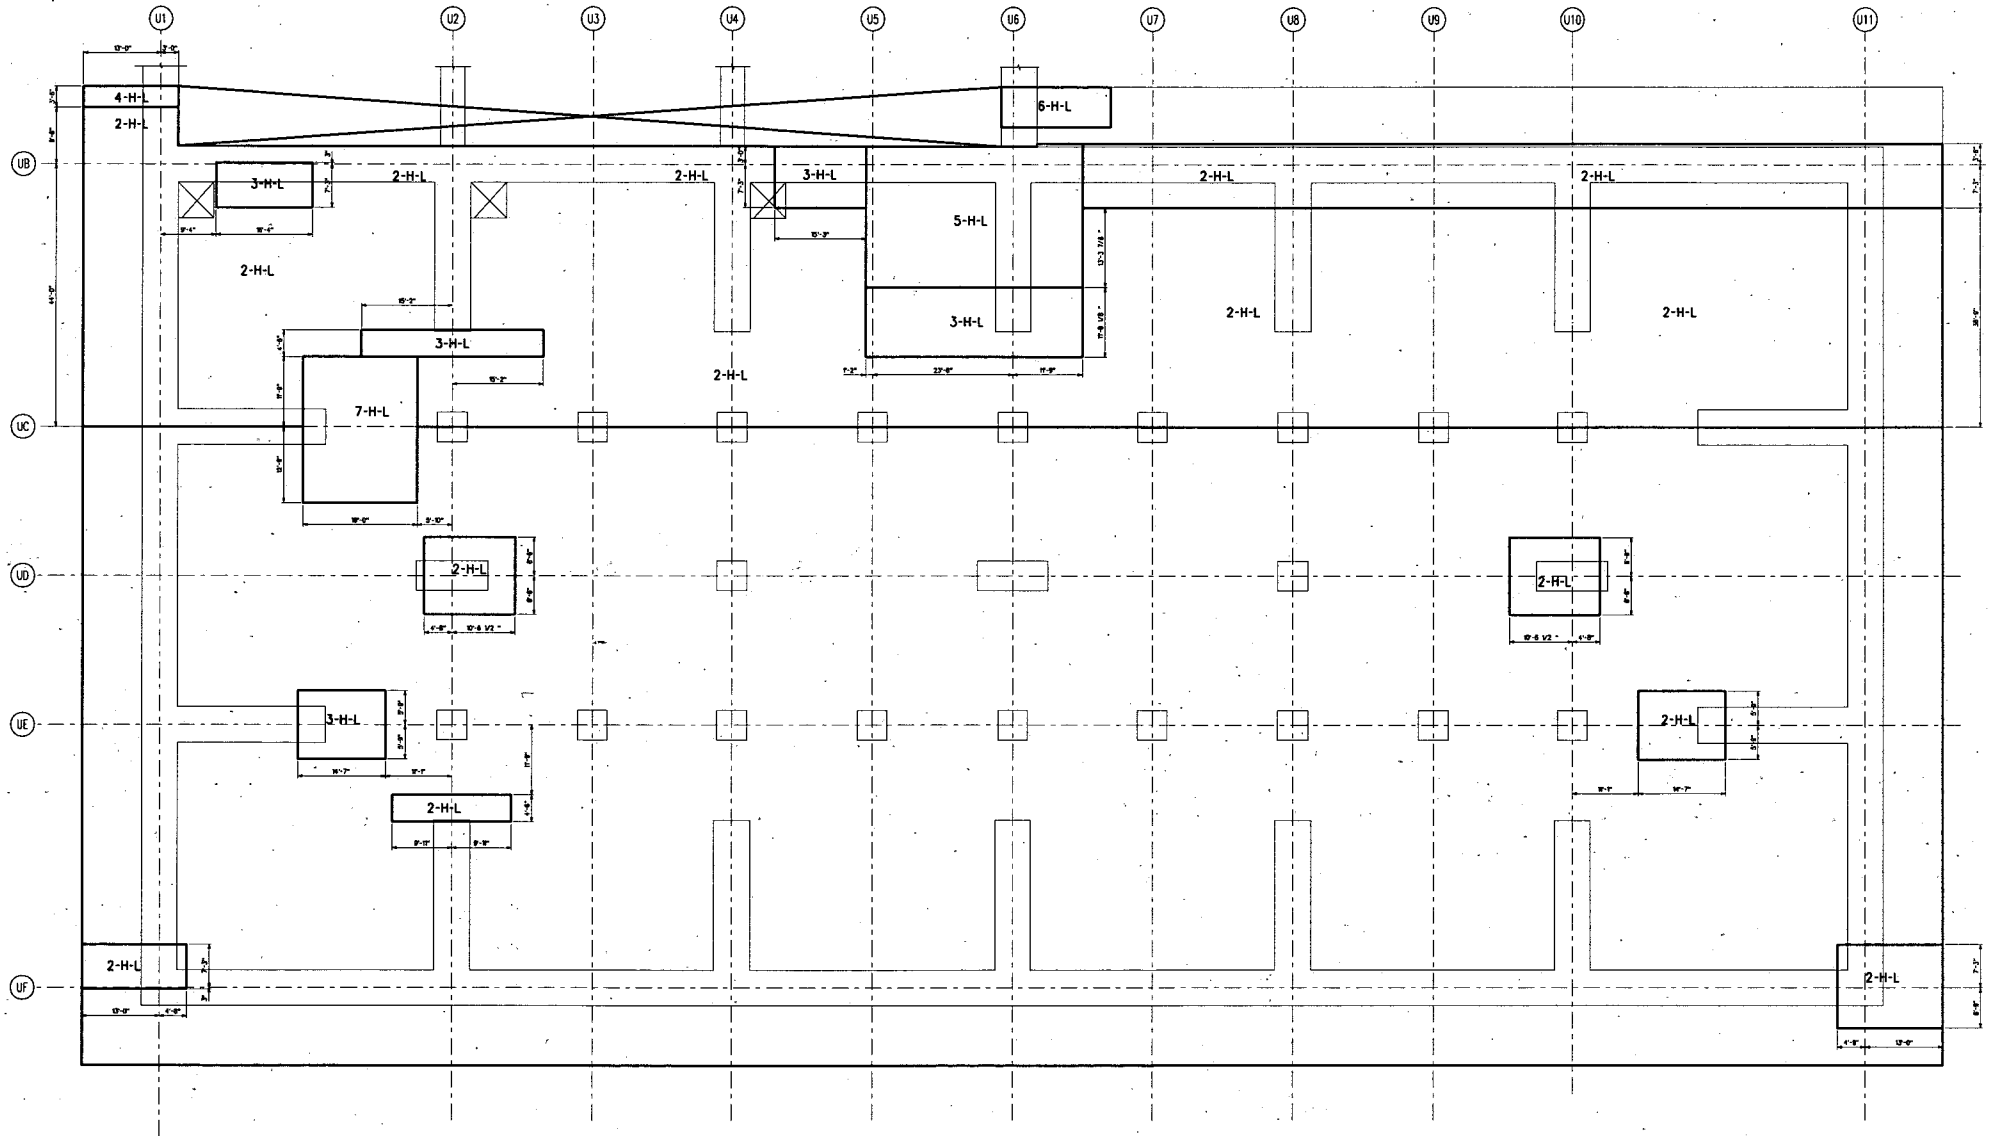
H.6-129: ULTIMATE HEAT SINK BASIN: BASE MAT PLAN
